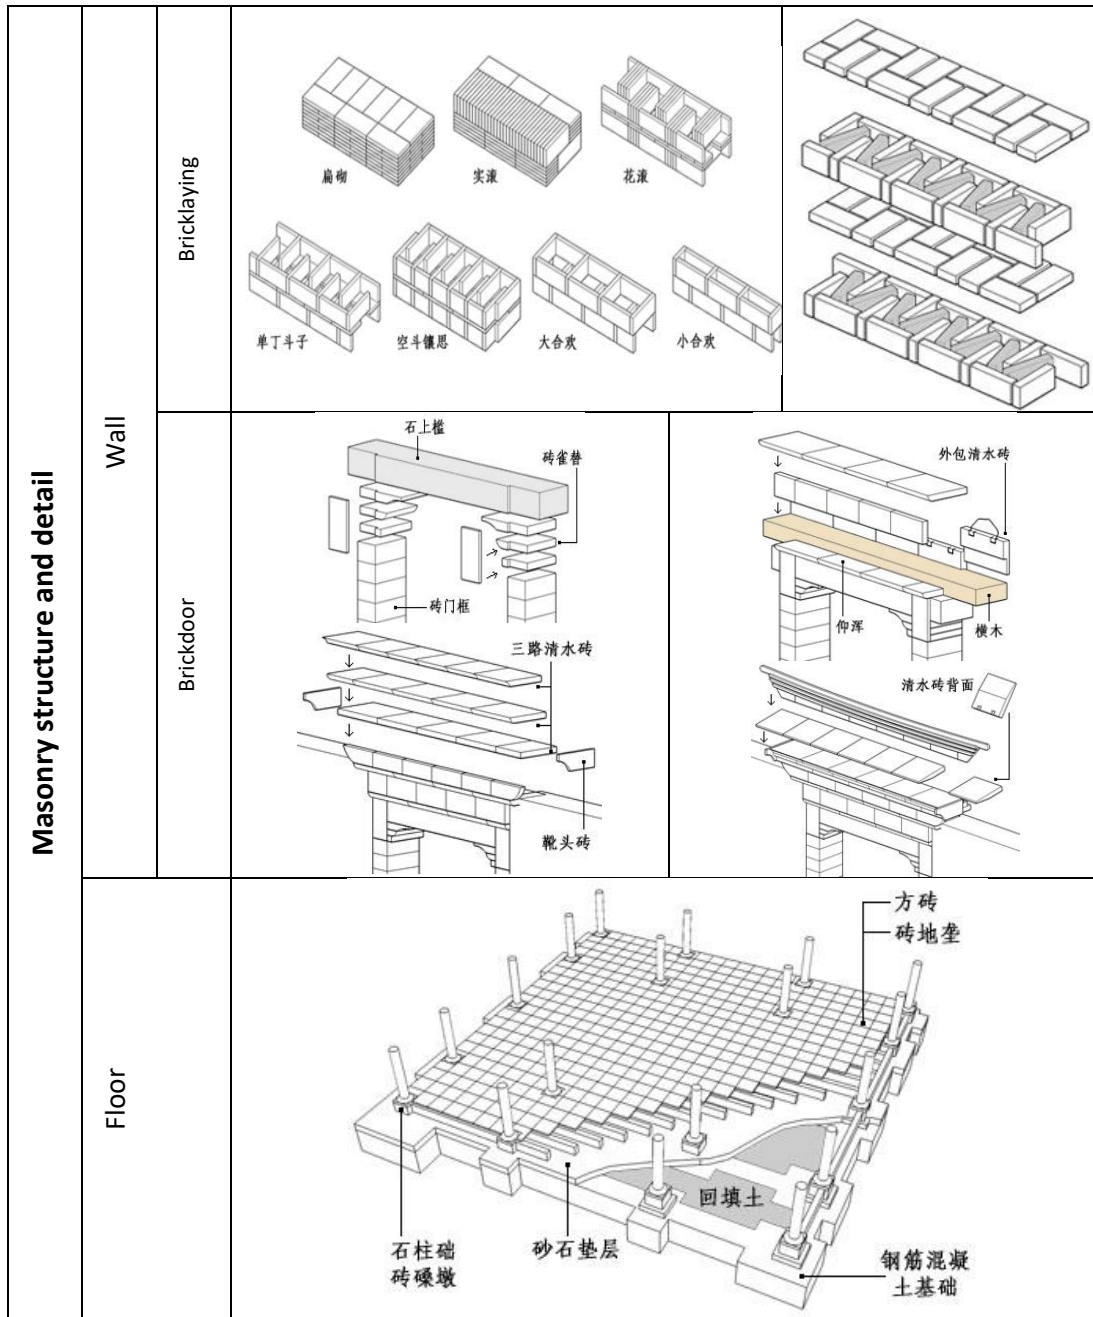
Historical Building Repair Technical Guidelines (self-painted)
